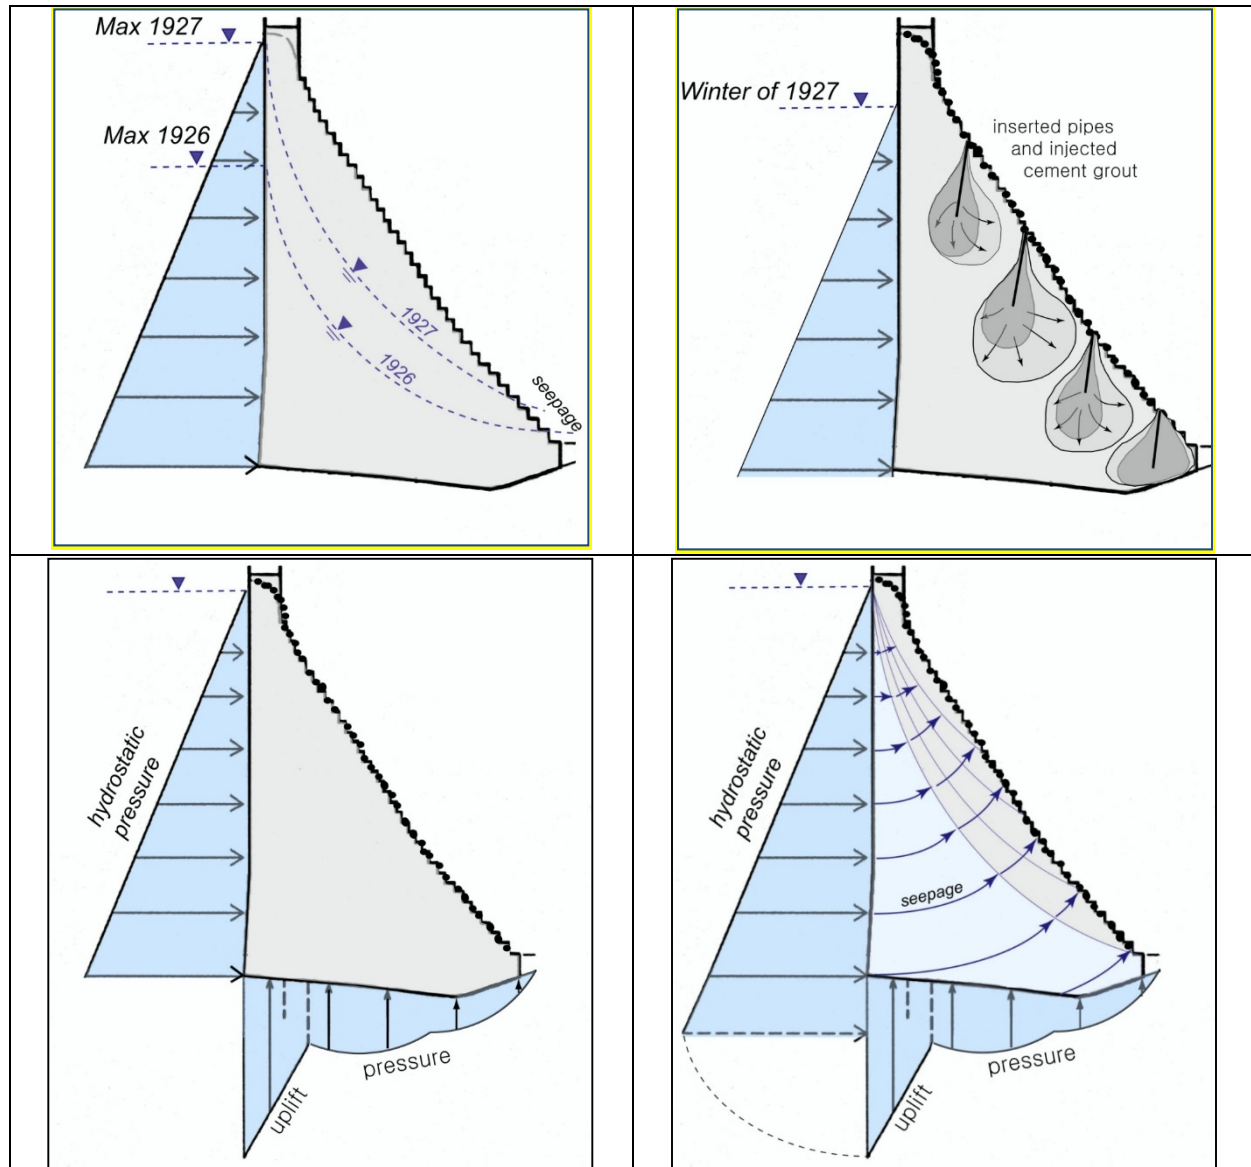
Plugging of the dam's contraction joints on the downstream face could have had disastrous consequences by creating full reservoir pressure against the interior faces of the main dam, especially if the grouting behind the face was anything less than a 100% seal. This was a detail apparently missed by all of the post-failure reviews in 1928.
